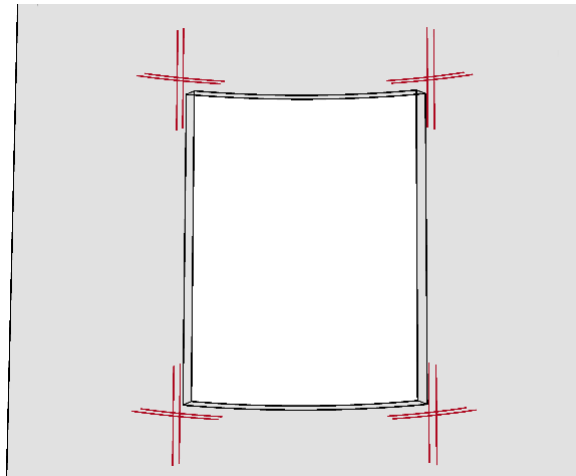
FE model of the vertical and horizontal opening corner reinforcements.
